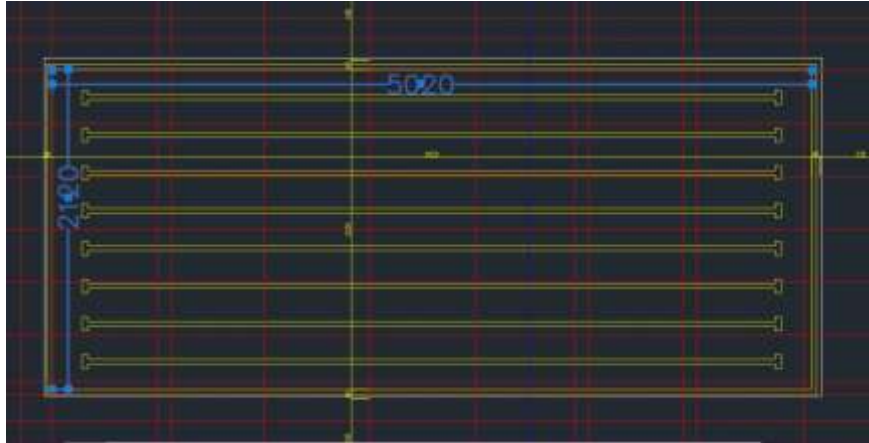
Technical Drawing of The Pool With AutoCAD Program
